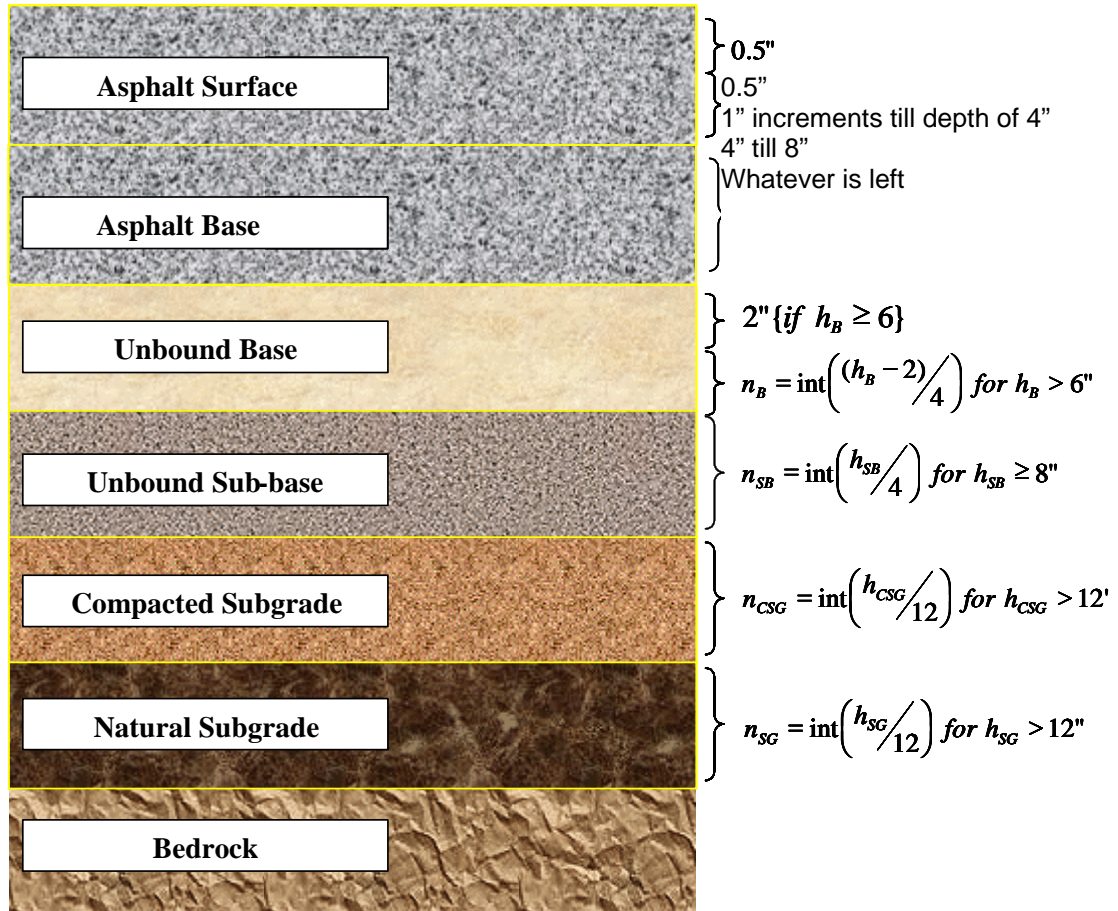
Layered Pavement Cross-Section for Flexible Pavement Systems (No Sub layering beyond 8 Feet).
